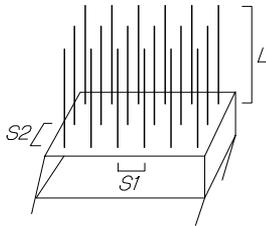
Recommended minimum lengths for grouted cablebolts
